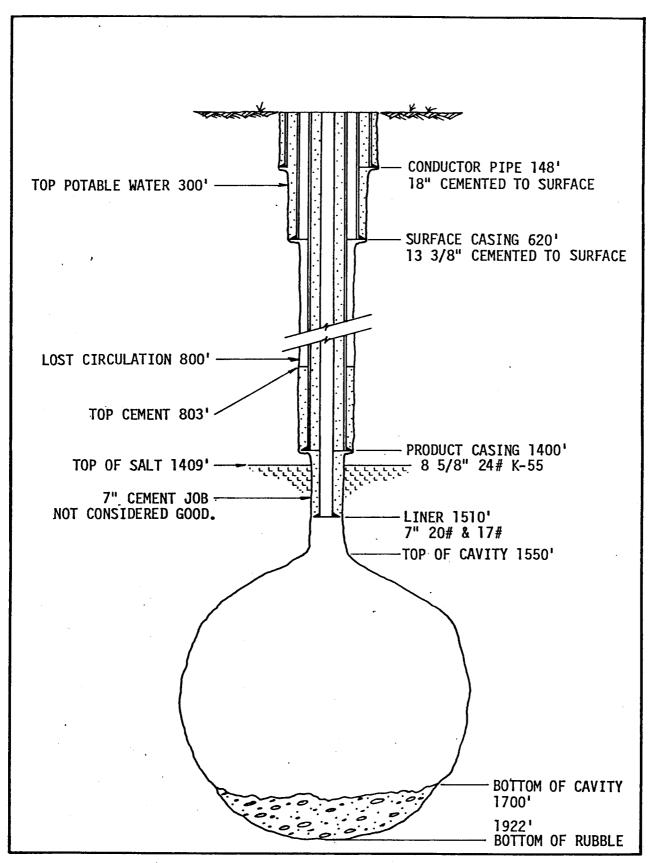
Sketch Showing Present Construction of Storage Well NO.1
